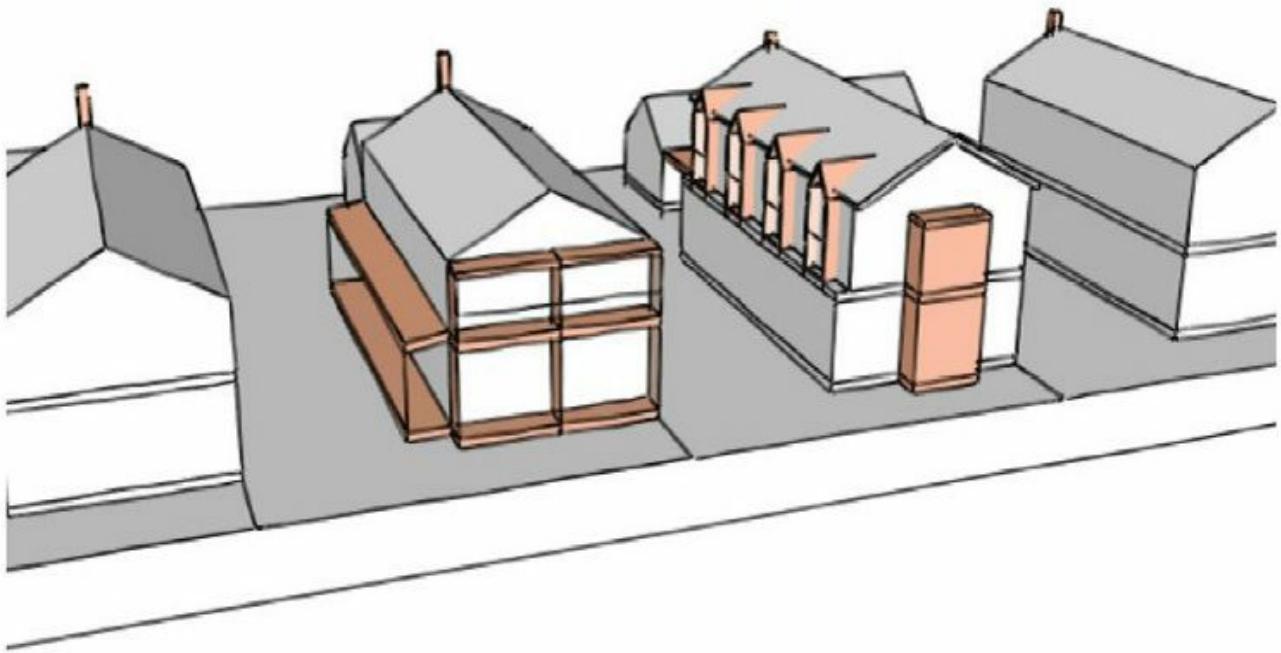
Typical Allotment Layout of a Side Yard House (indicative only — Layout and size may change)
